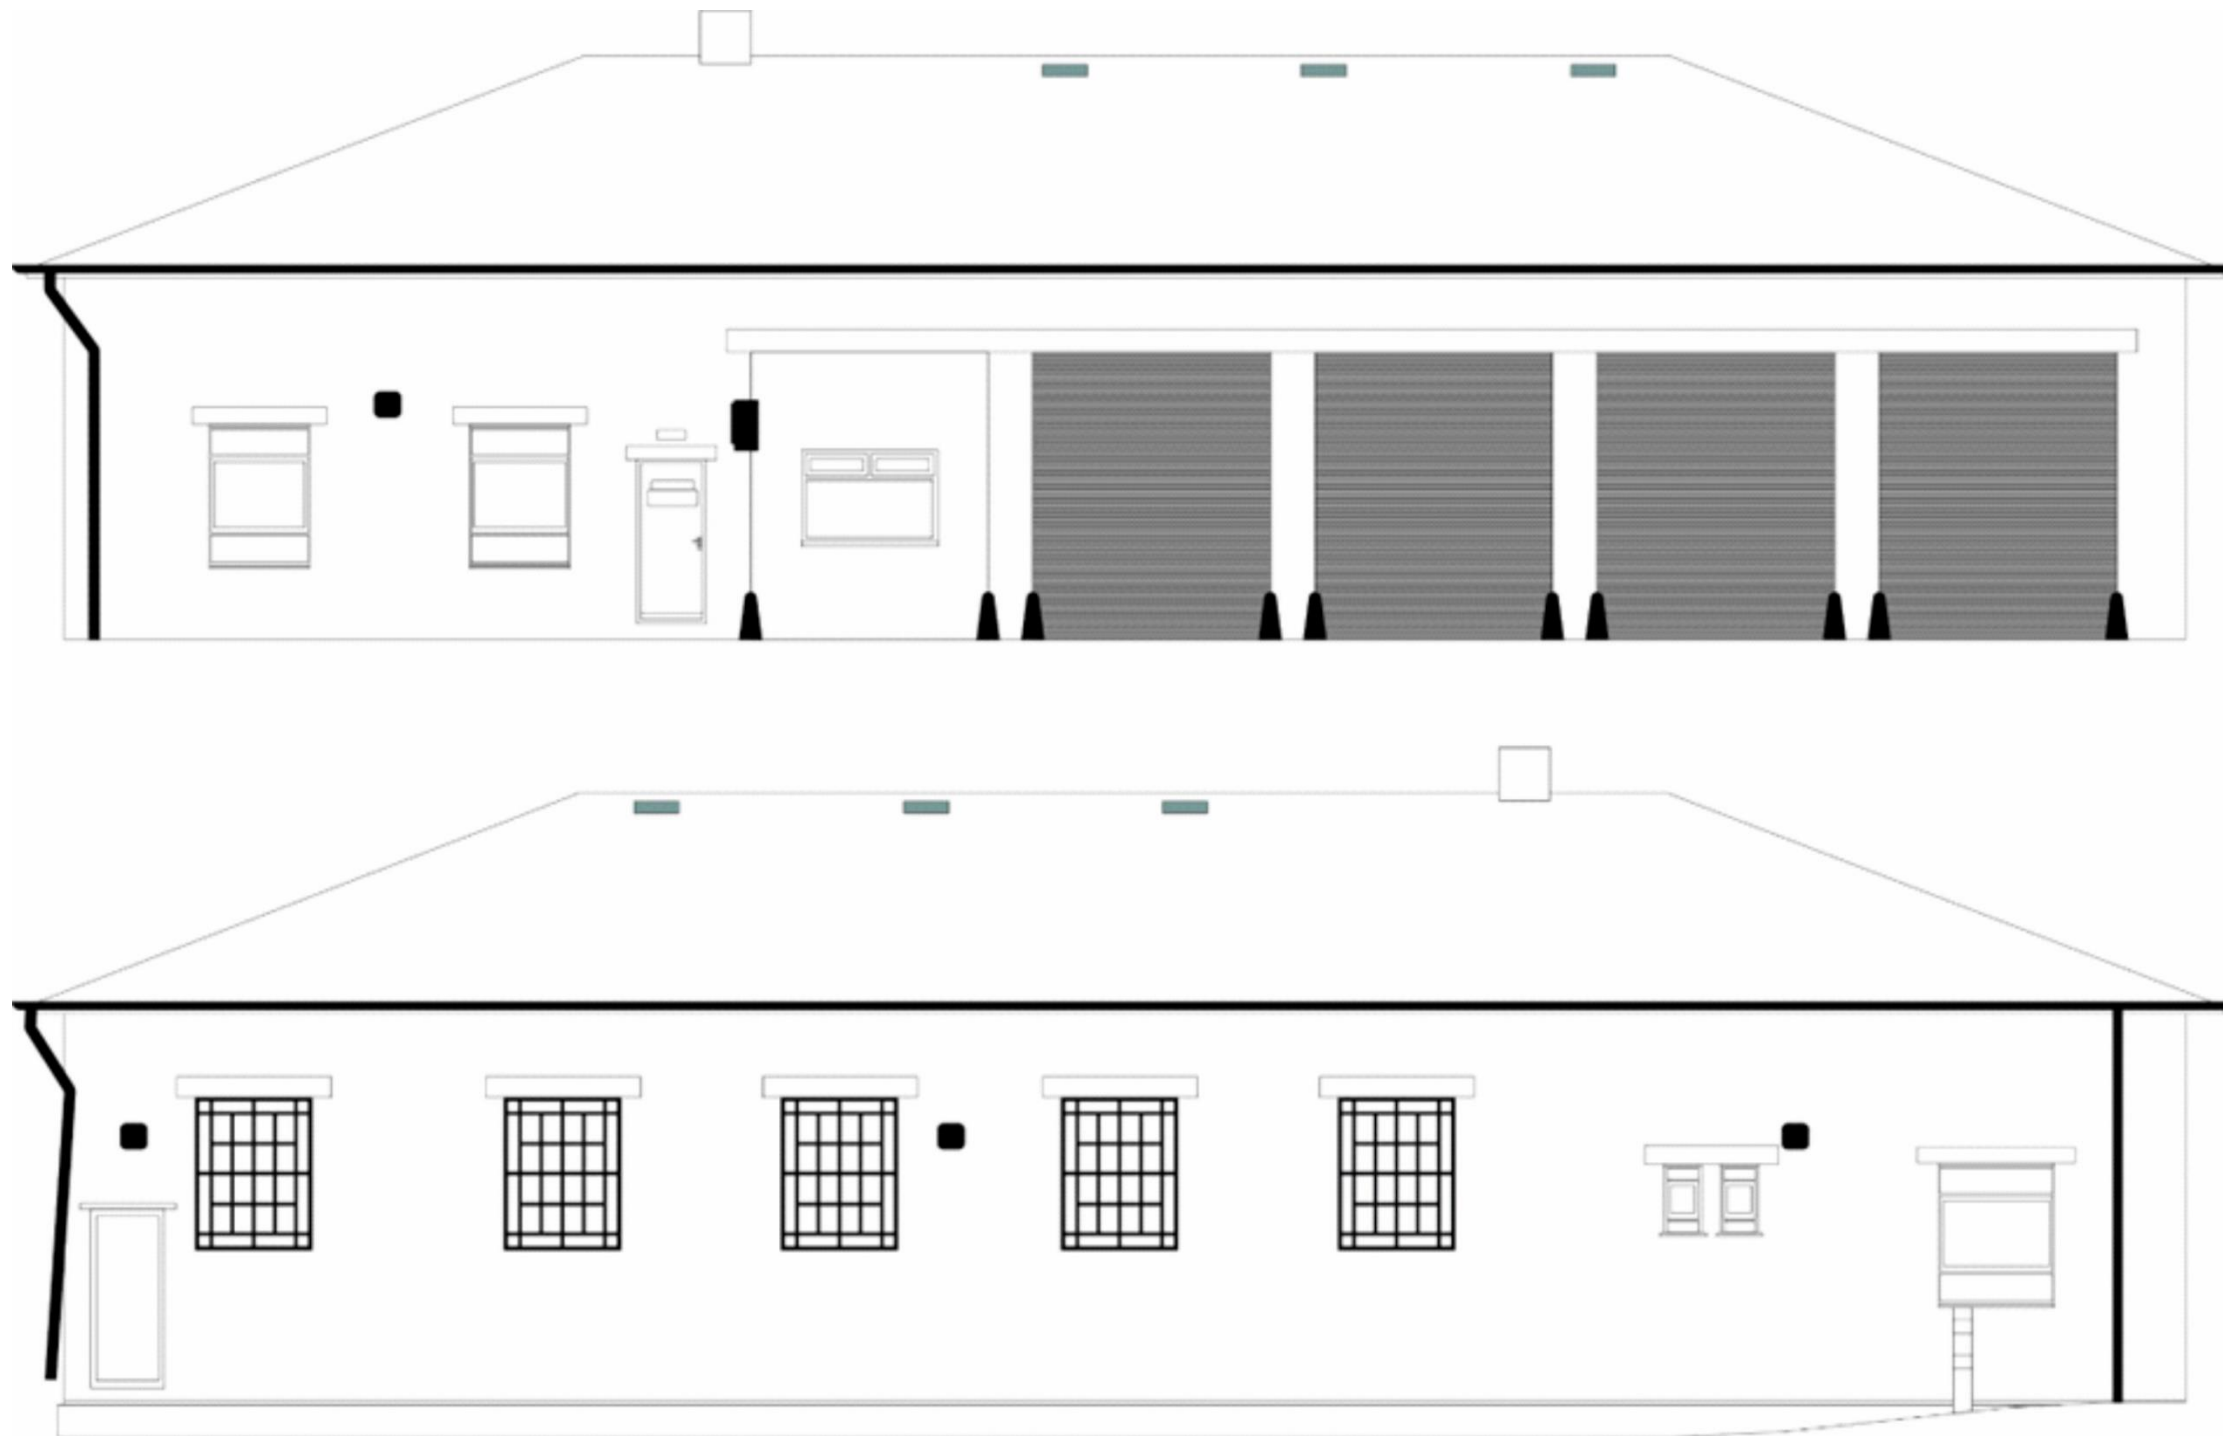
Northeast and southwest elevations, 1:100 @ A3
